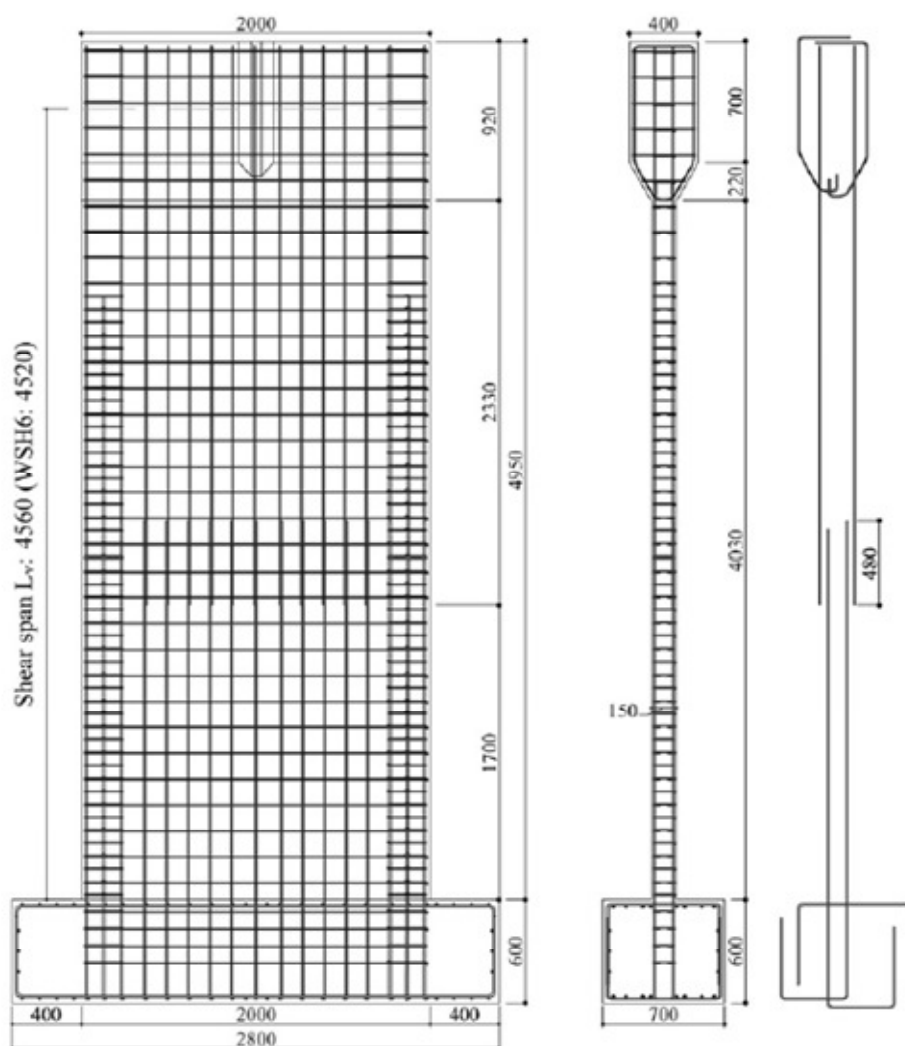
Vertical reinforcement layout of Test Unit WSH3 tested by Dazio et al (2009) (All dimensions in mm. 25 mm = 1 in.)
